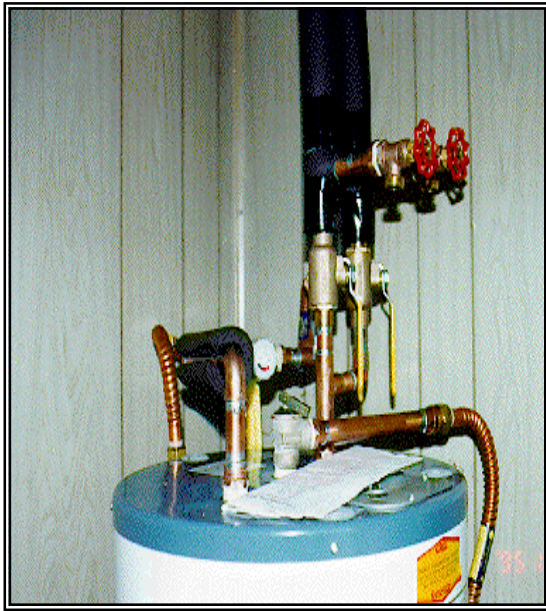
External tank piping not completely insulated from heat losses.
